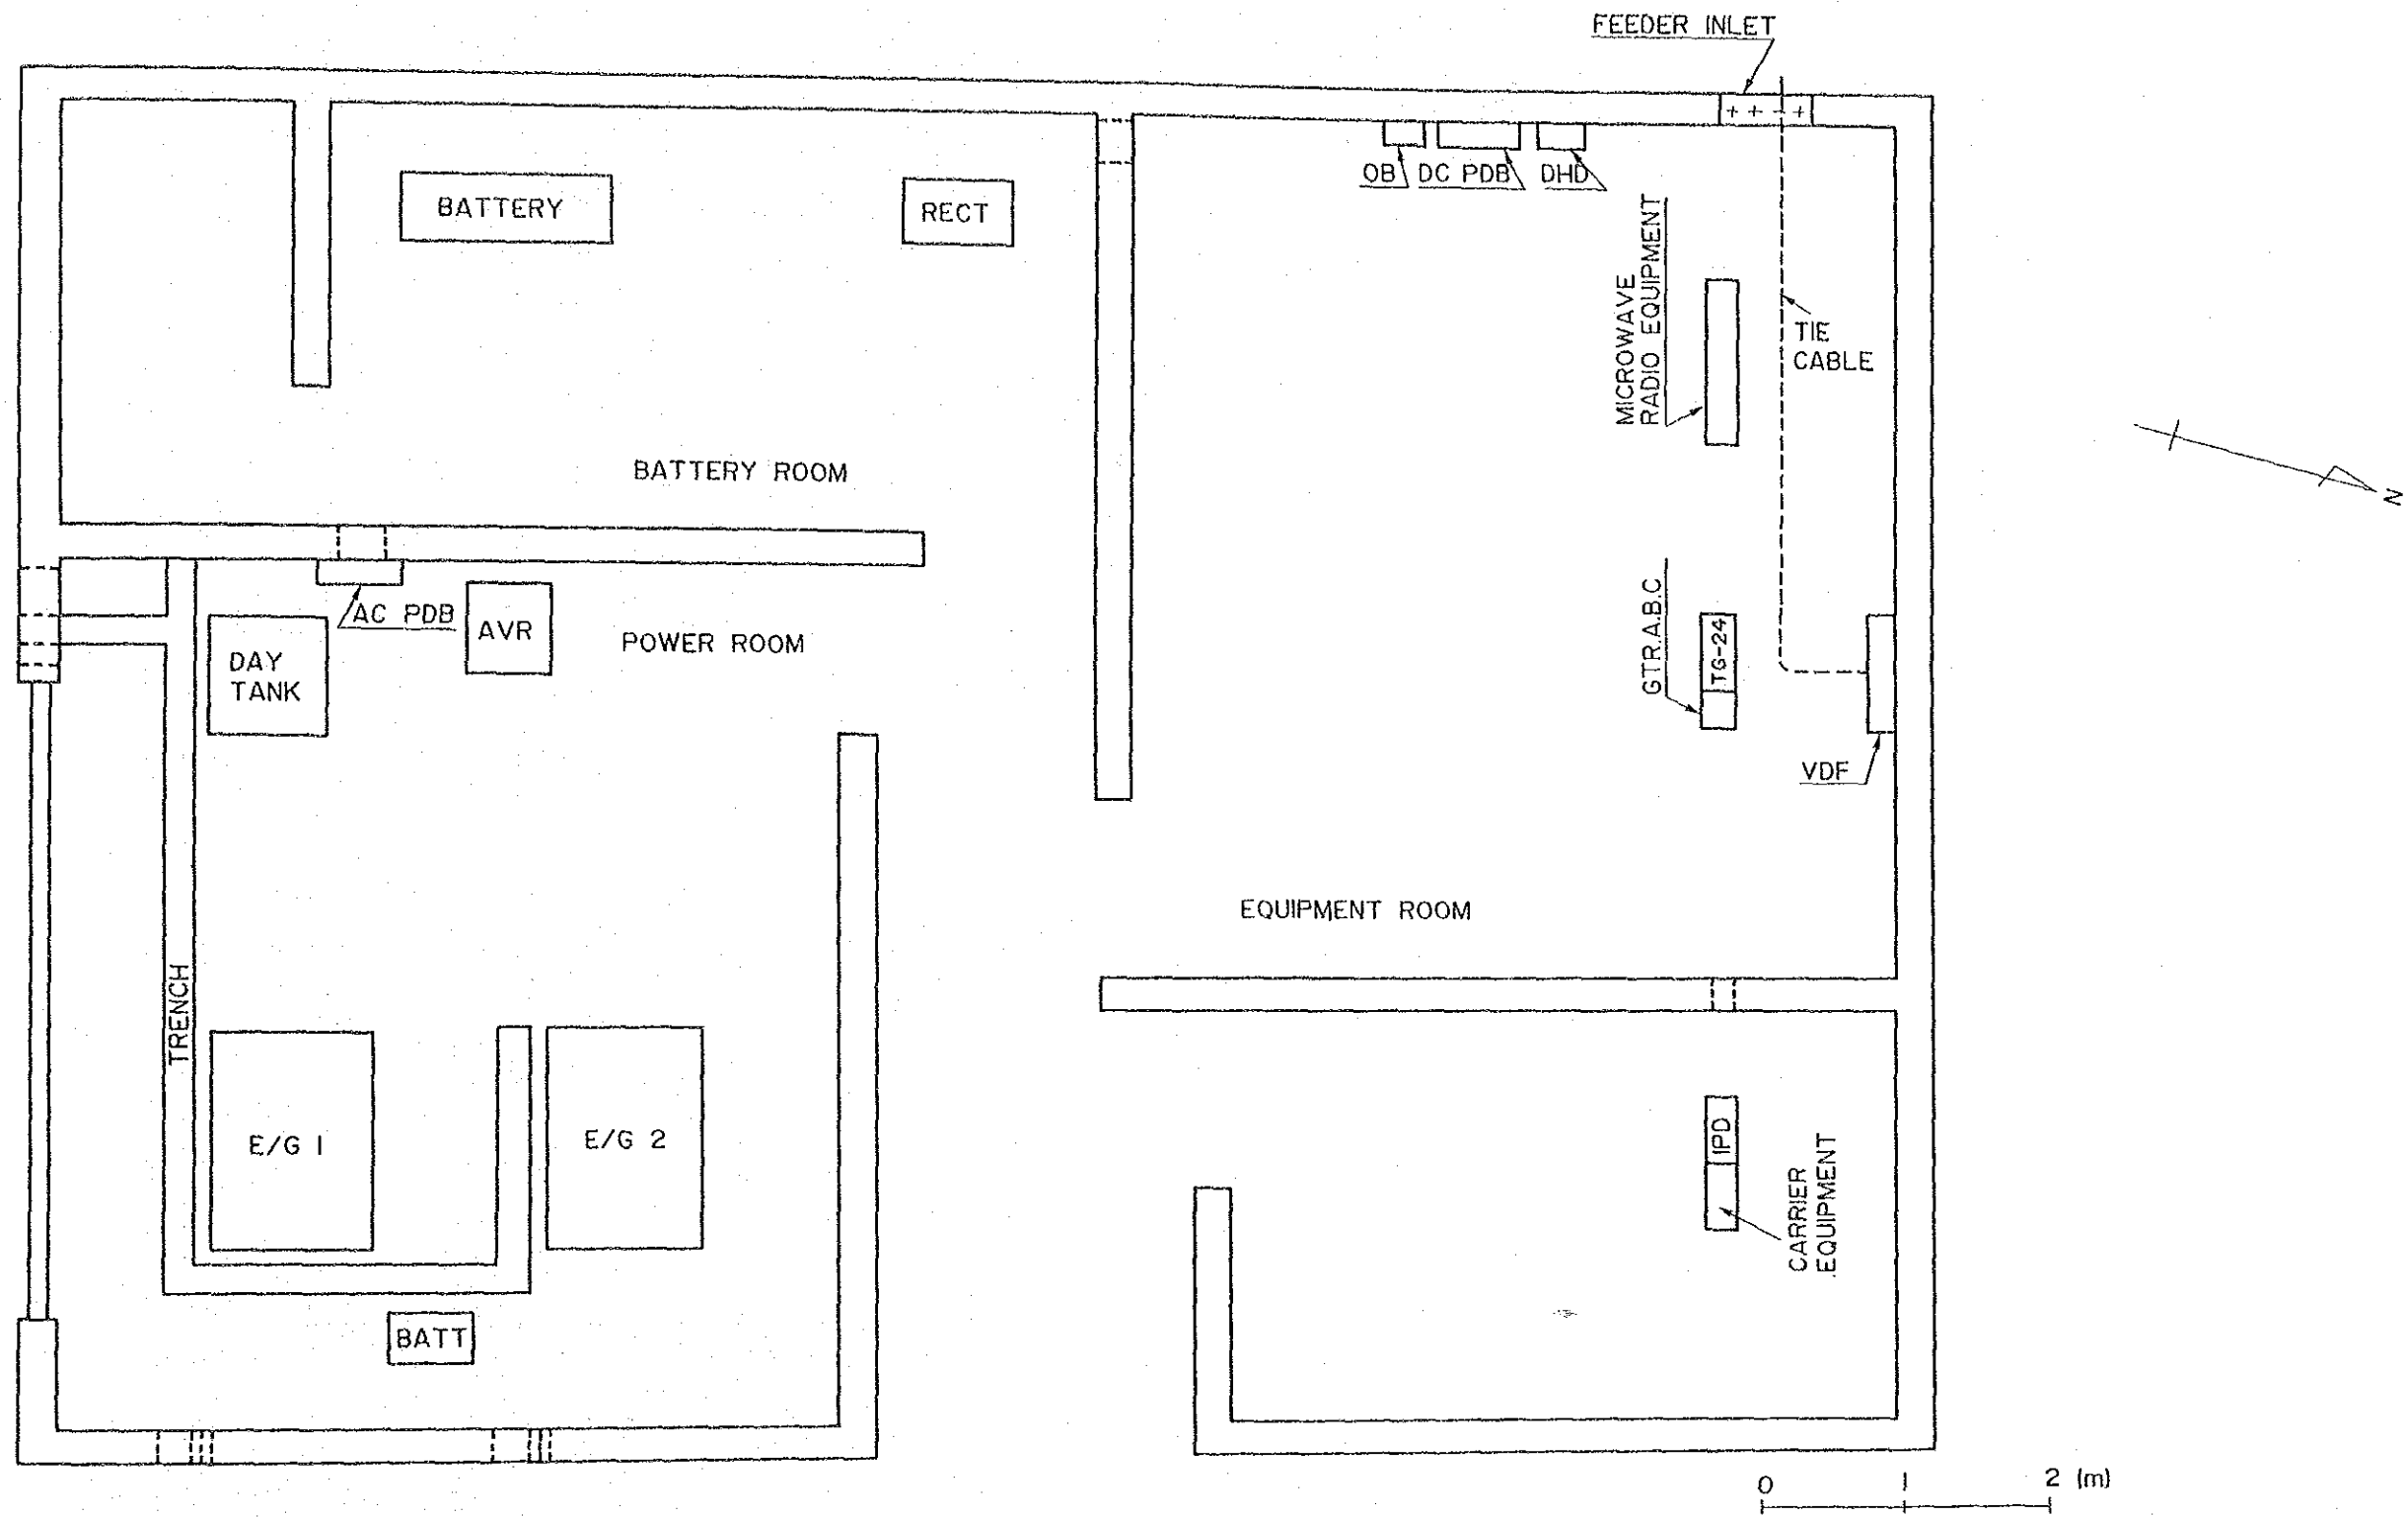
Floor Layout at Tharrawaddy Microwave Station
